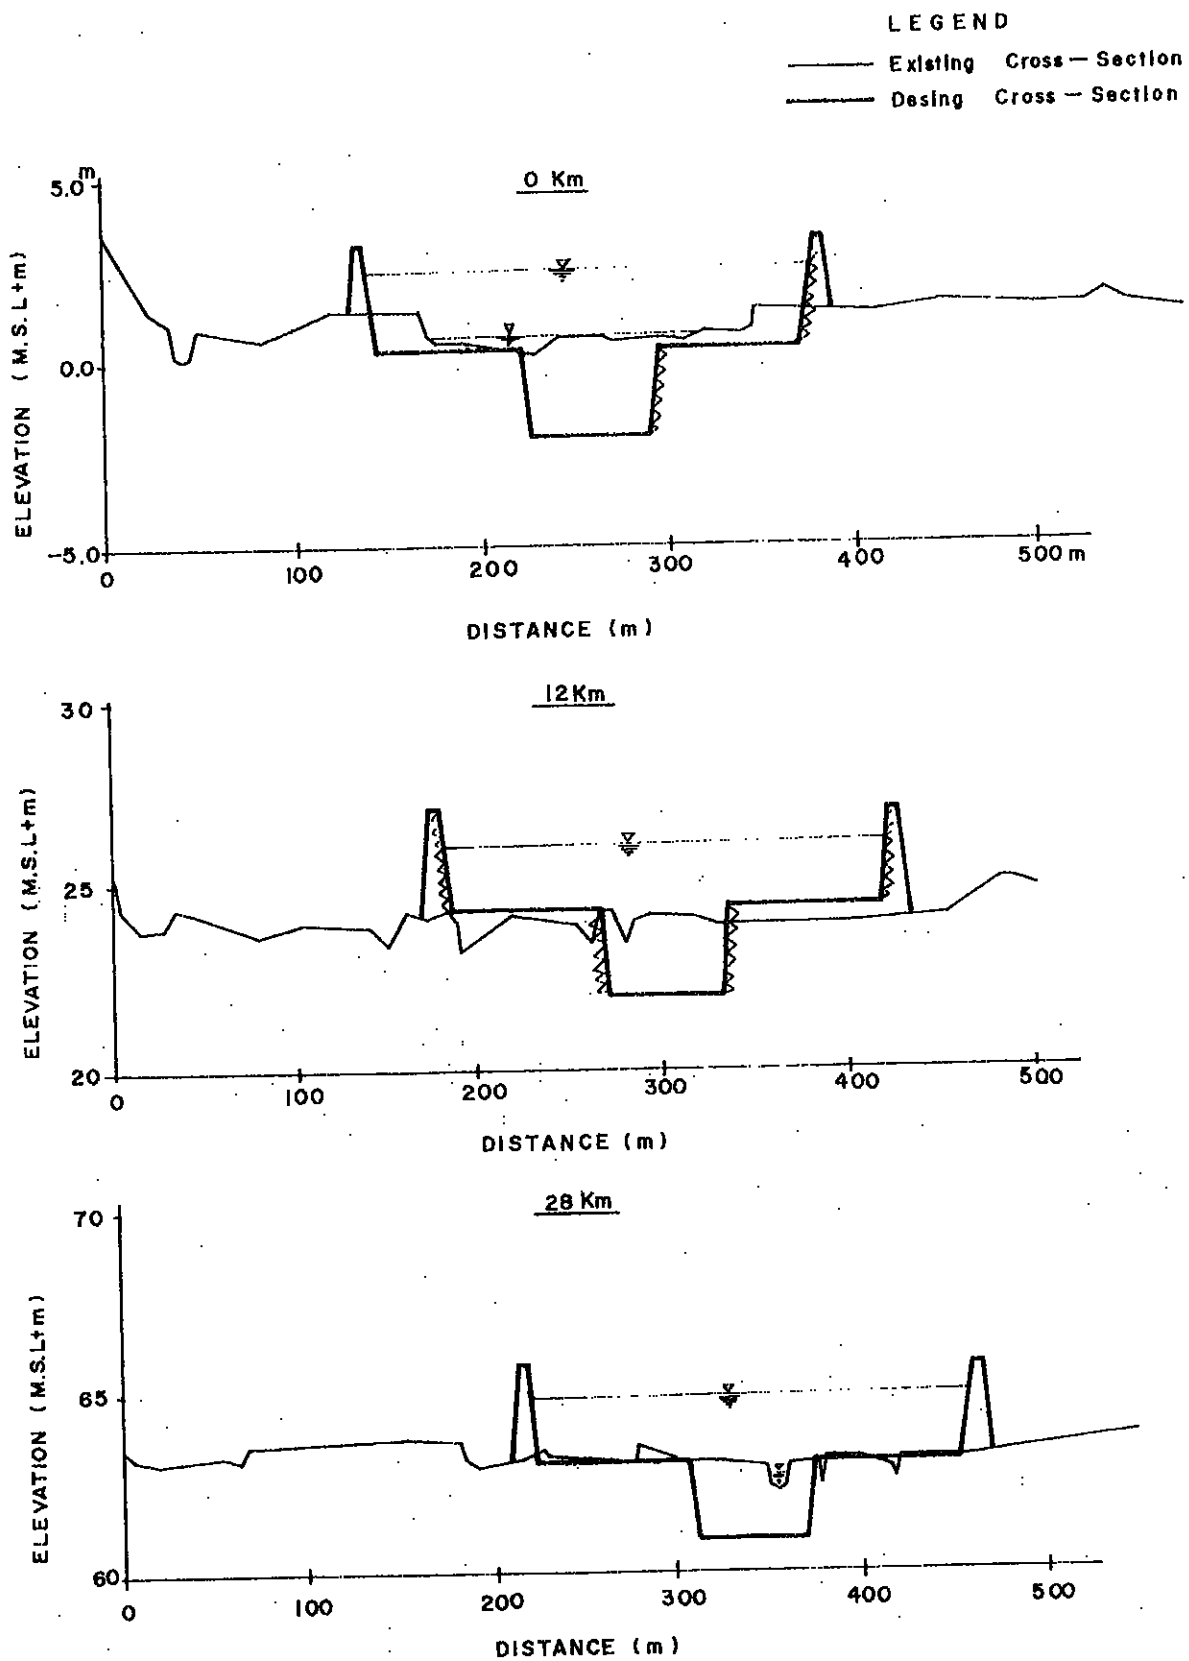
(1/4) TYPICAL CROSS SECTION (ACHIGUATE RIVER)
